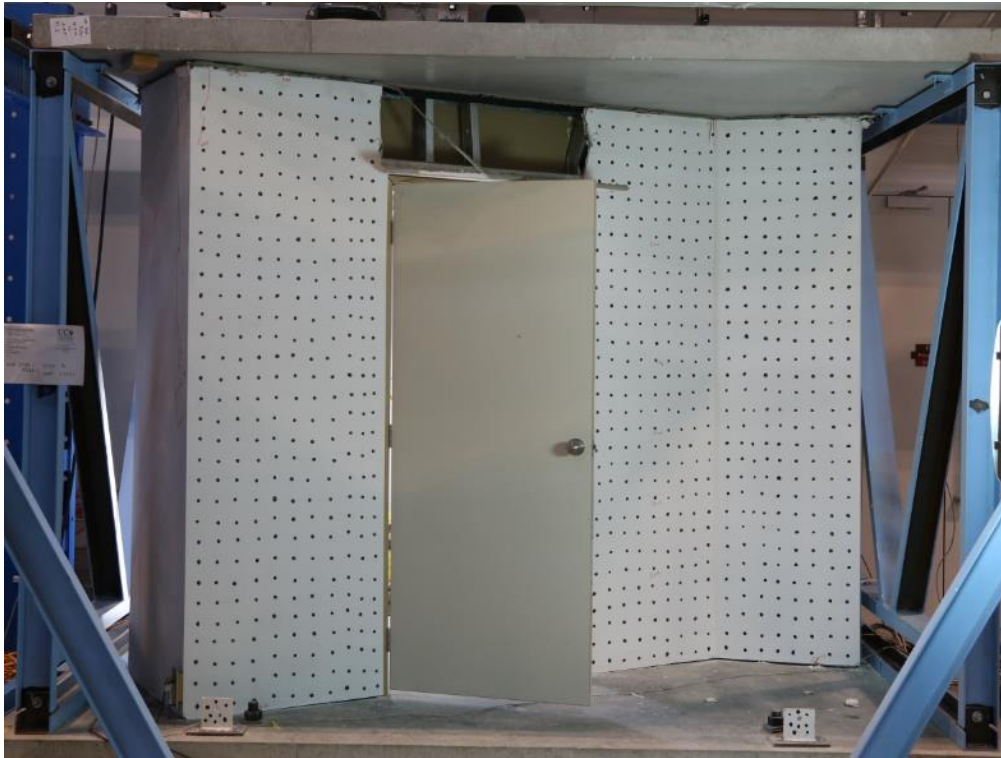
Specimen A3 - Step 16 – specimen after completion of test prior to removal of linings
